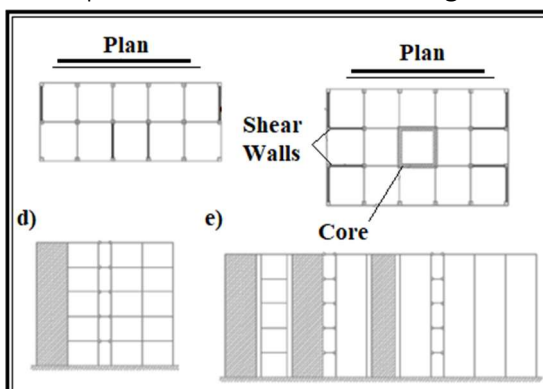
Construction scheme of building: d – framed-connection; e- with connections and shear-walls
